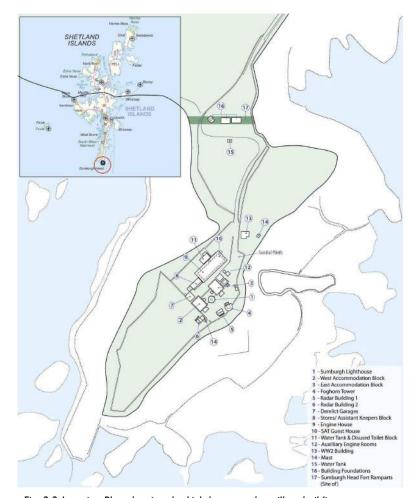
Location Plan showing the Lighthouse and ancillary buildings
